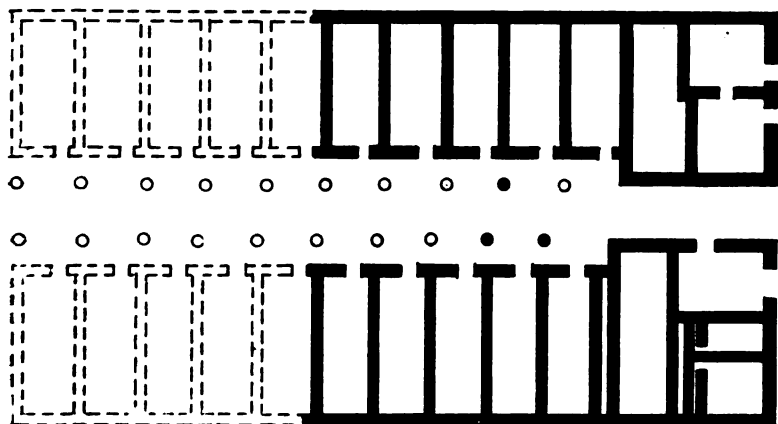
PLAN OF "L-SHAPED" BUILDINGS AT CHESTERS.
